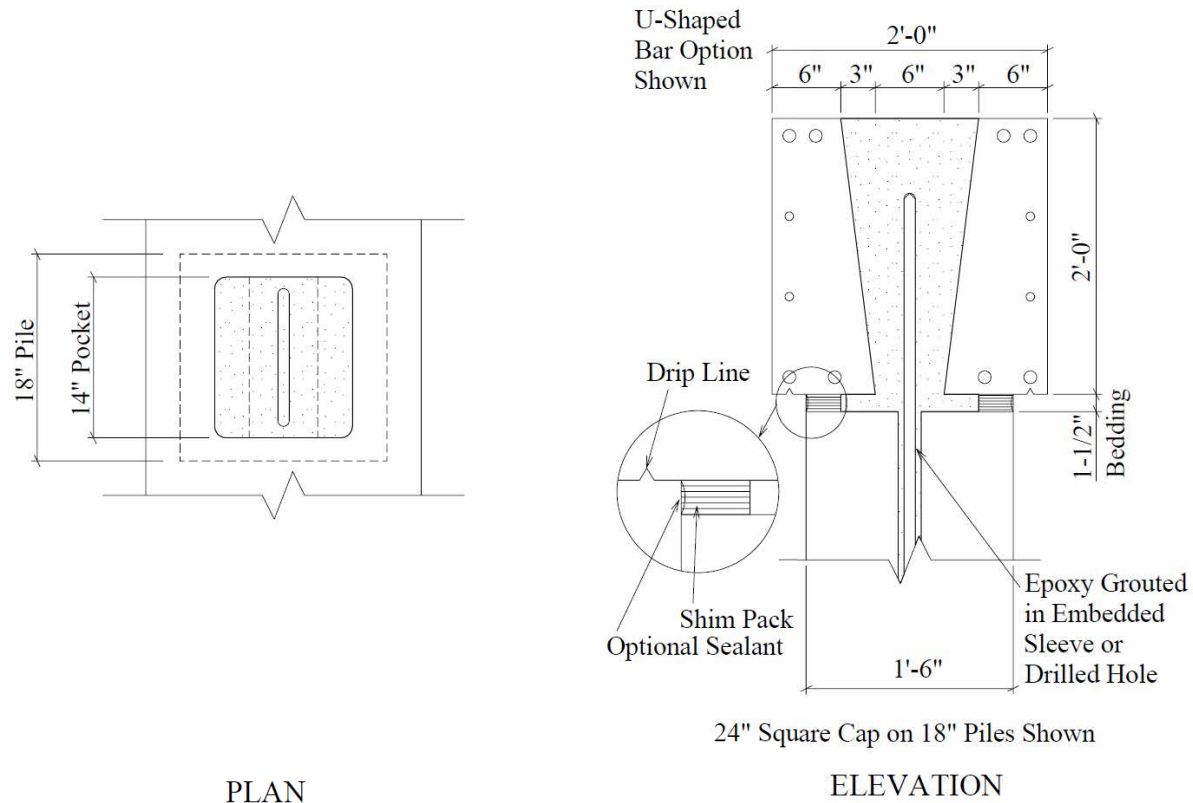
Grouted Pocket Connection in a precast bridge system (Matsumoto 2001).
